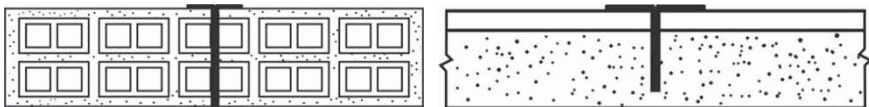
Schematic view of the anchor dowel applications: (left) to infill; (right) to frame members
